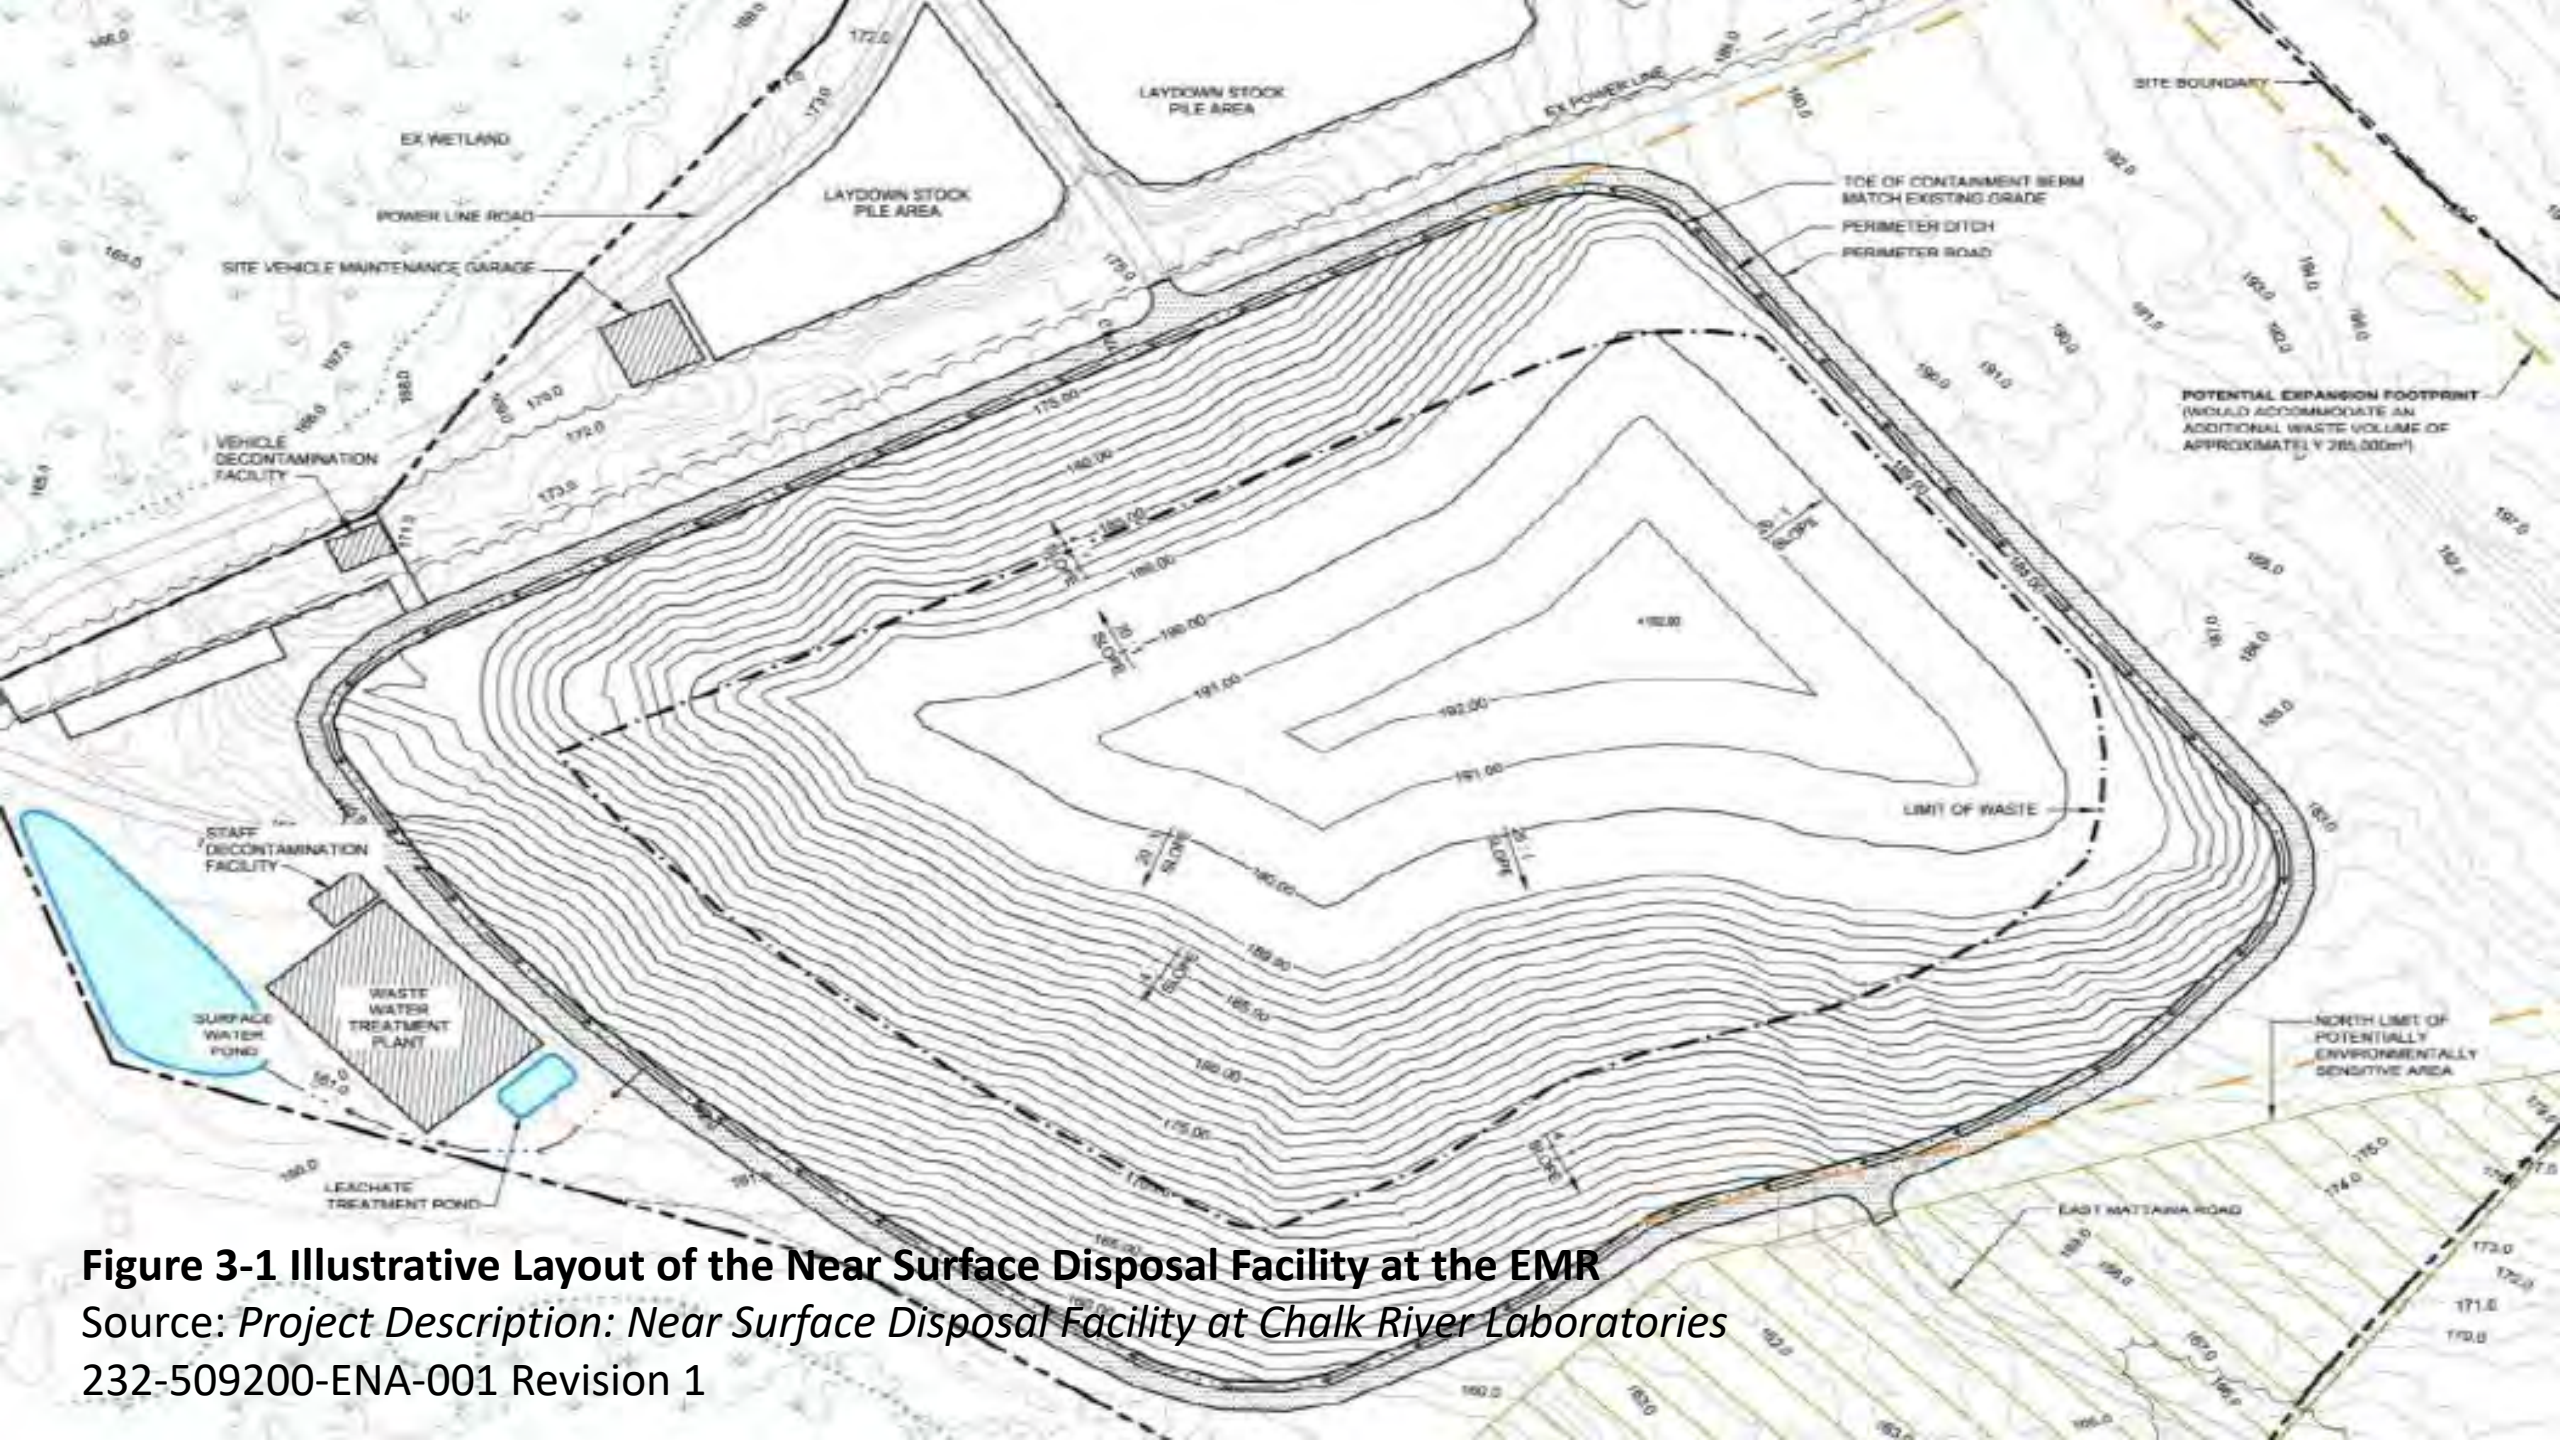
Illustrative Layout of the Near Surface Disposal Facility at the EMR
